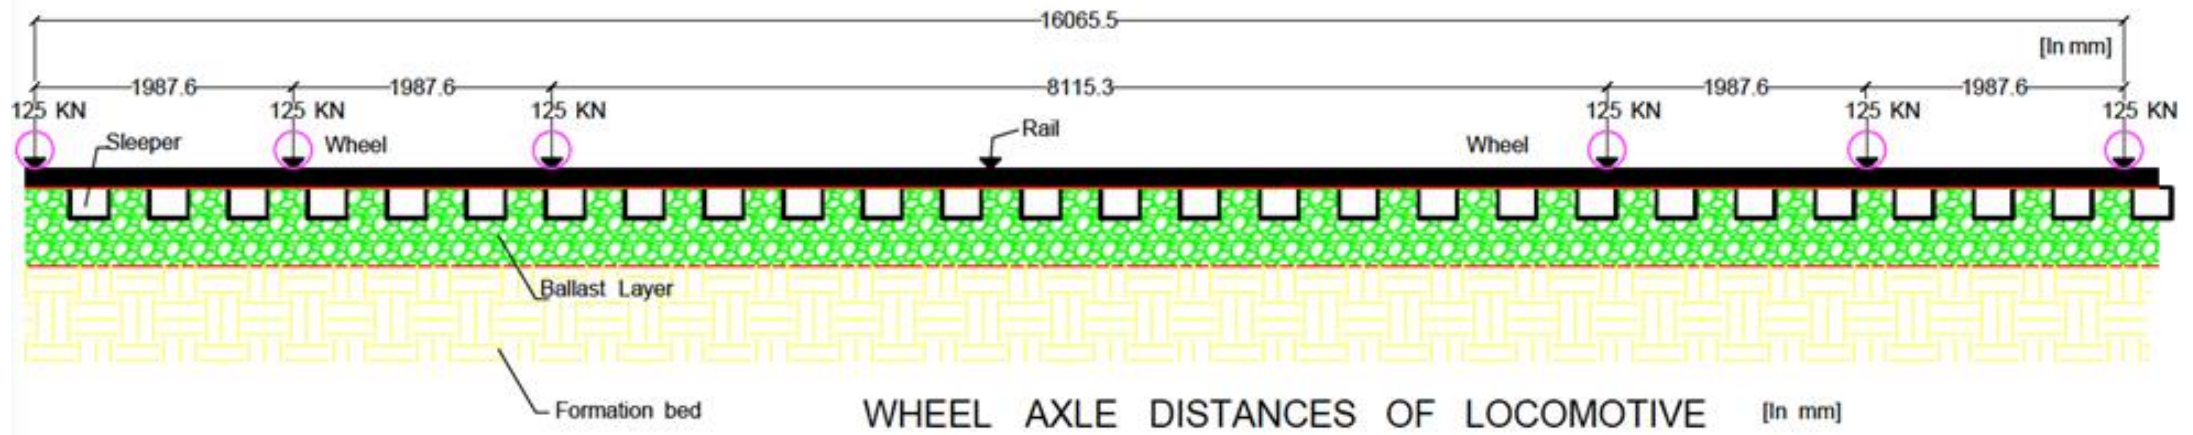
Track cross section & wheel axle distance of Locomotive
